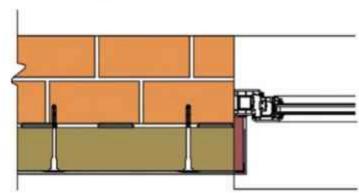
Head detail when window is set back from the face of the existing wall, where there is sufficient frame margin for the introduction of cold bridge insulation
